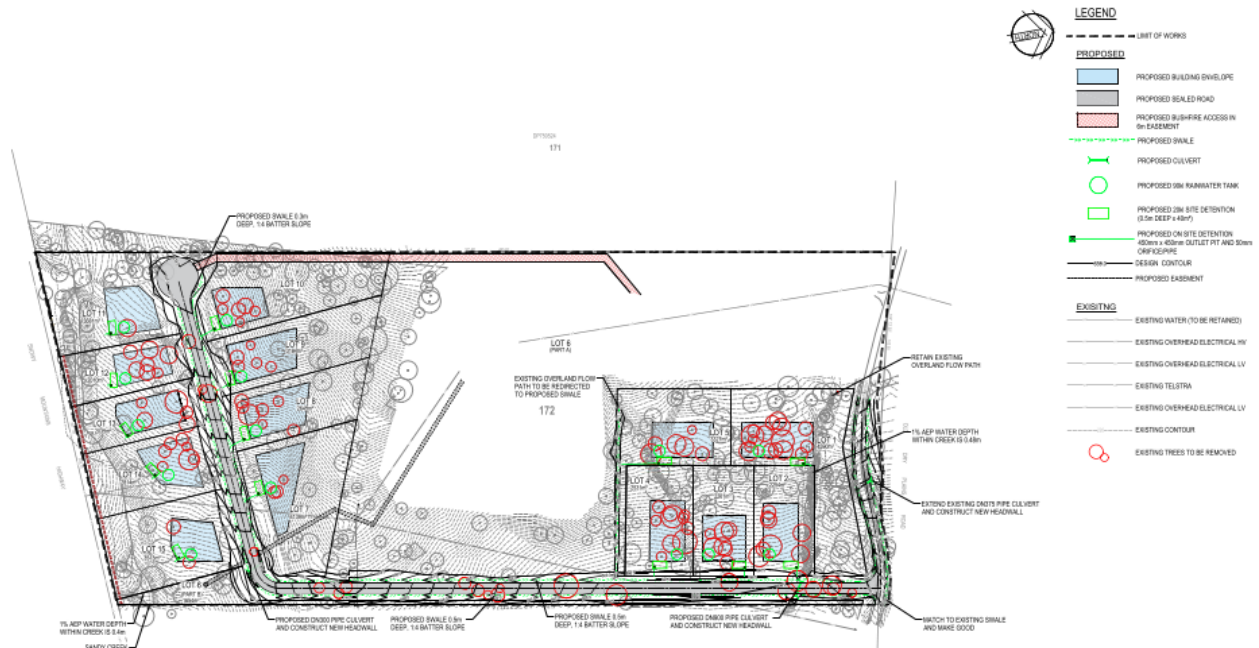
General Arrangement Plan demonstrating stormwater management (Page 4 of Plan Set)
